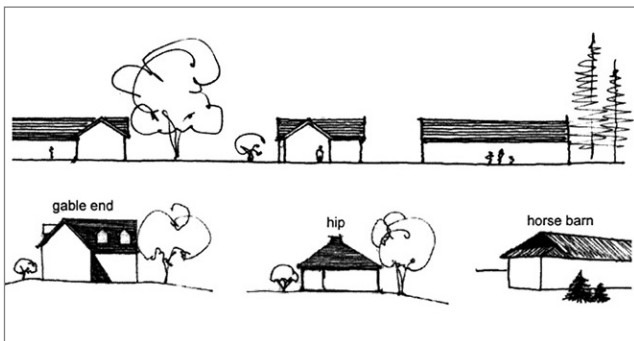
Elevation illustrating consistent one-story building height that does not provide interest in the landscape and is not recommended for the rural landscape (top). Rural roof form types (bottom) provide better variety.
